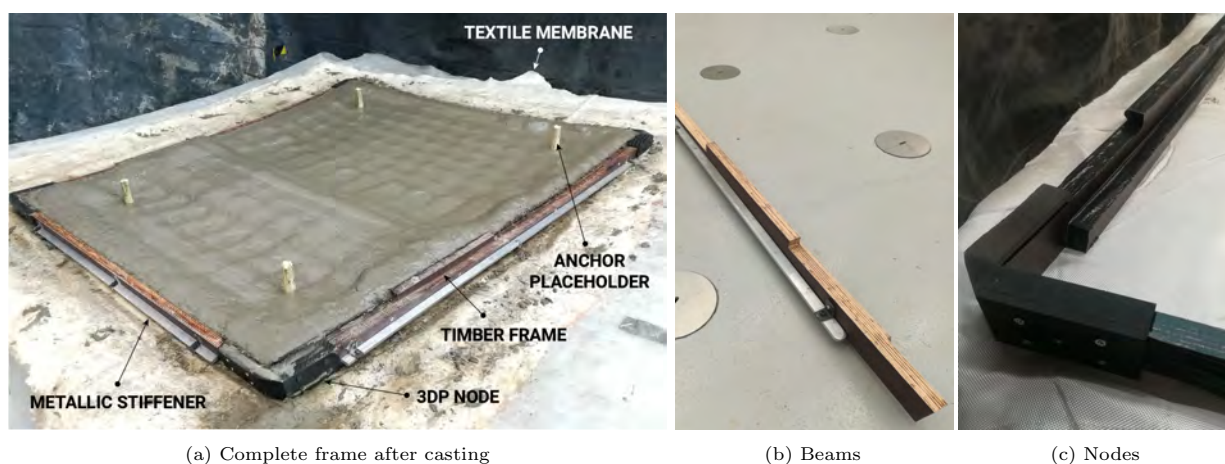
The reusable frame system as casting area on the flexible mould ©Robin Oval.
